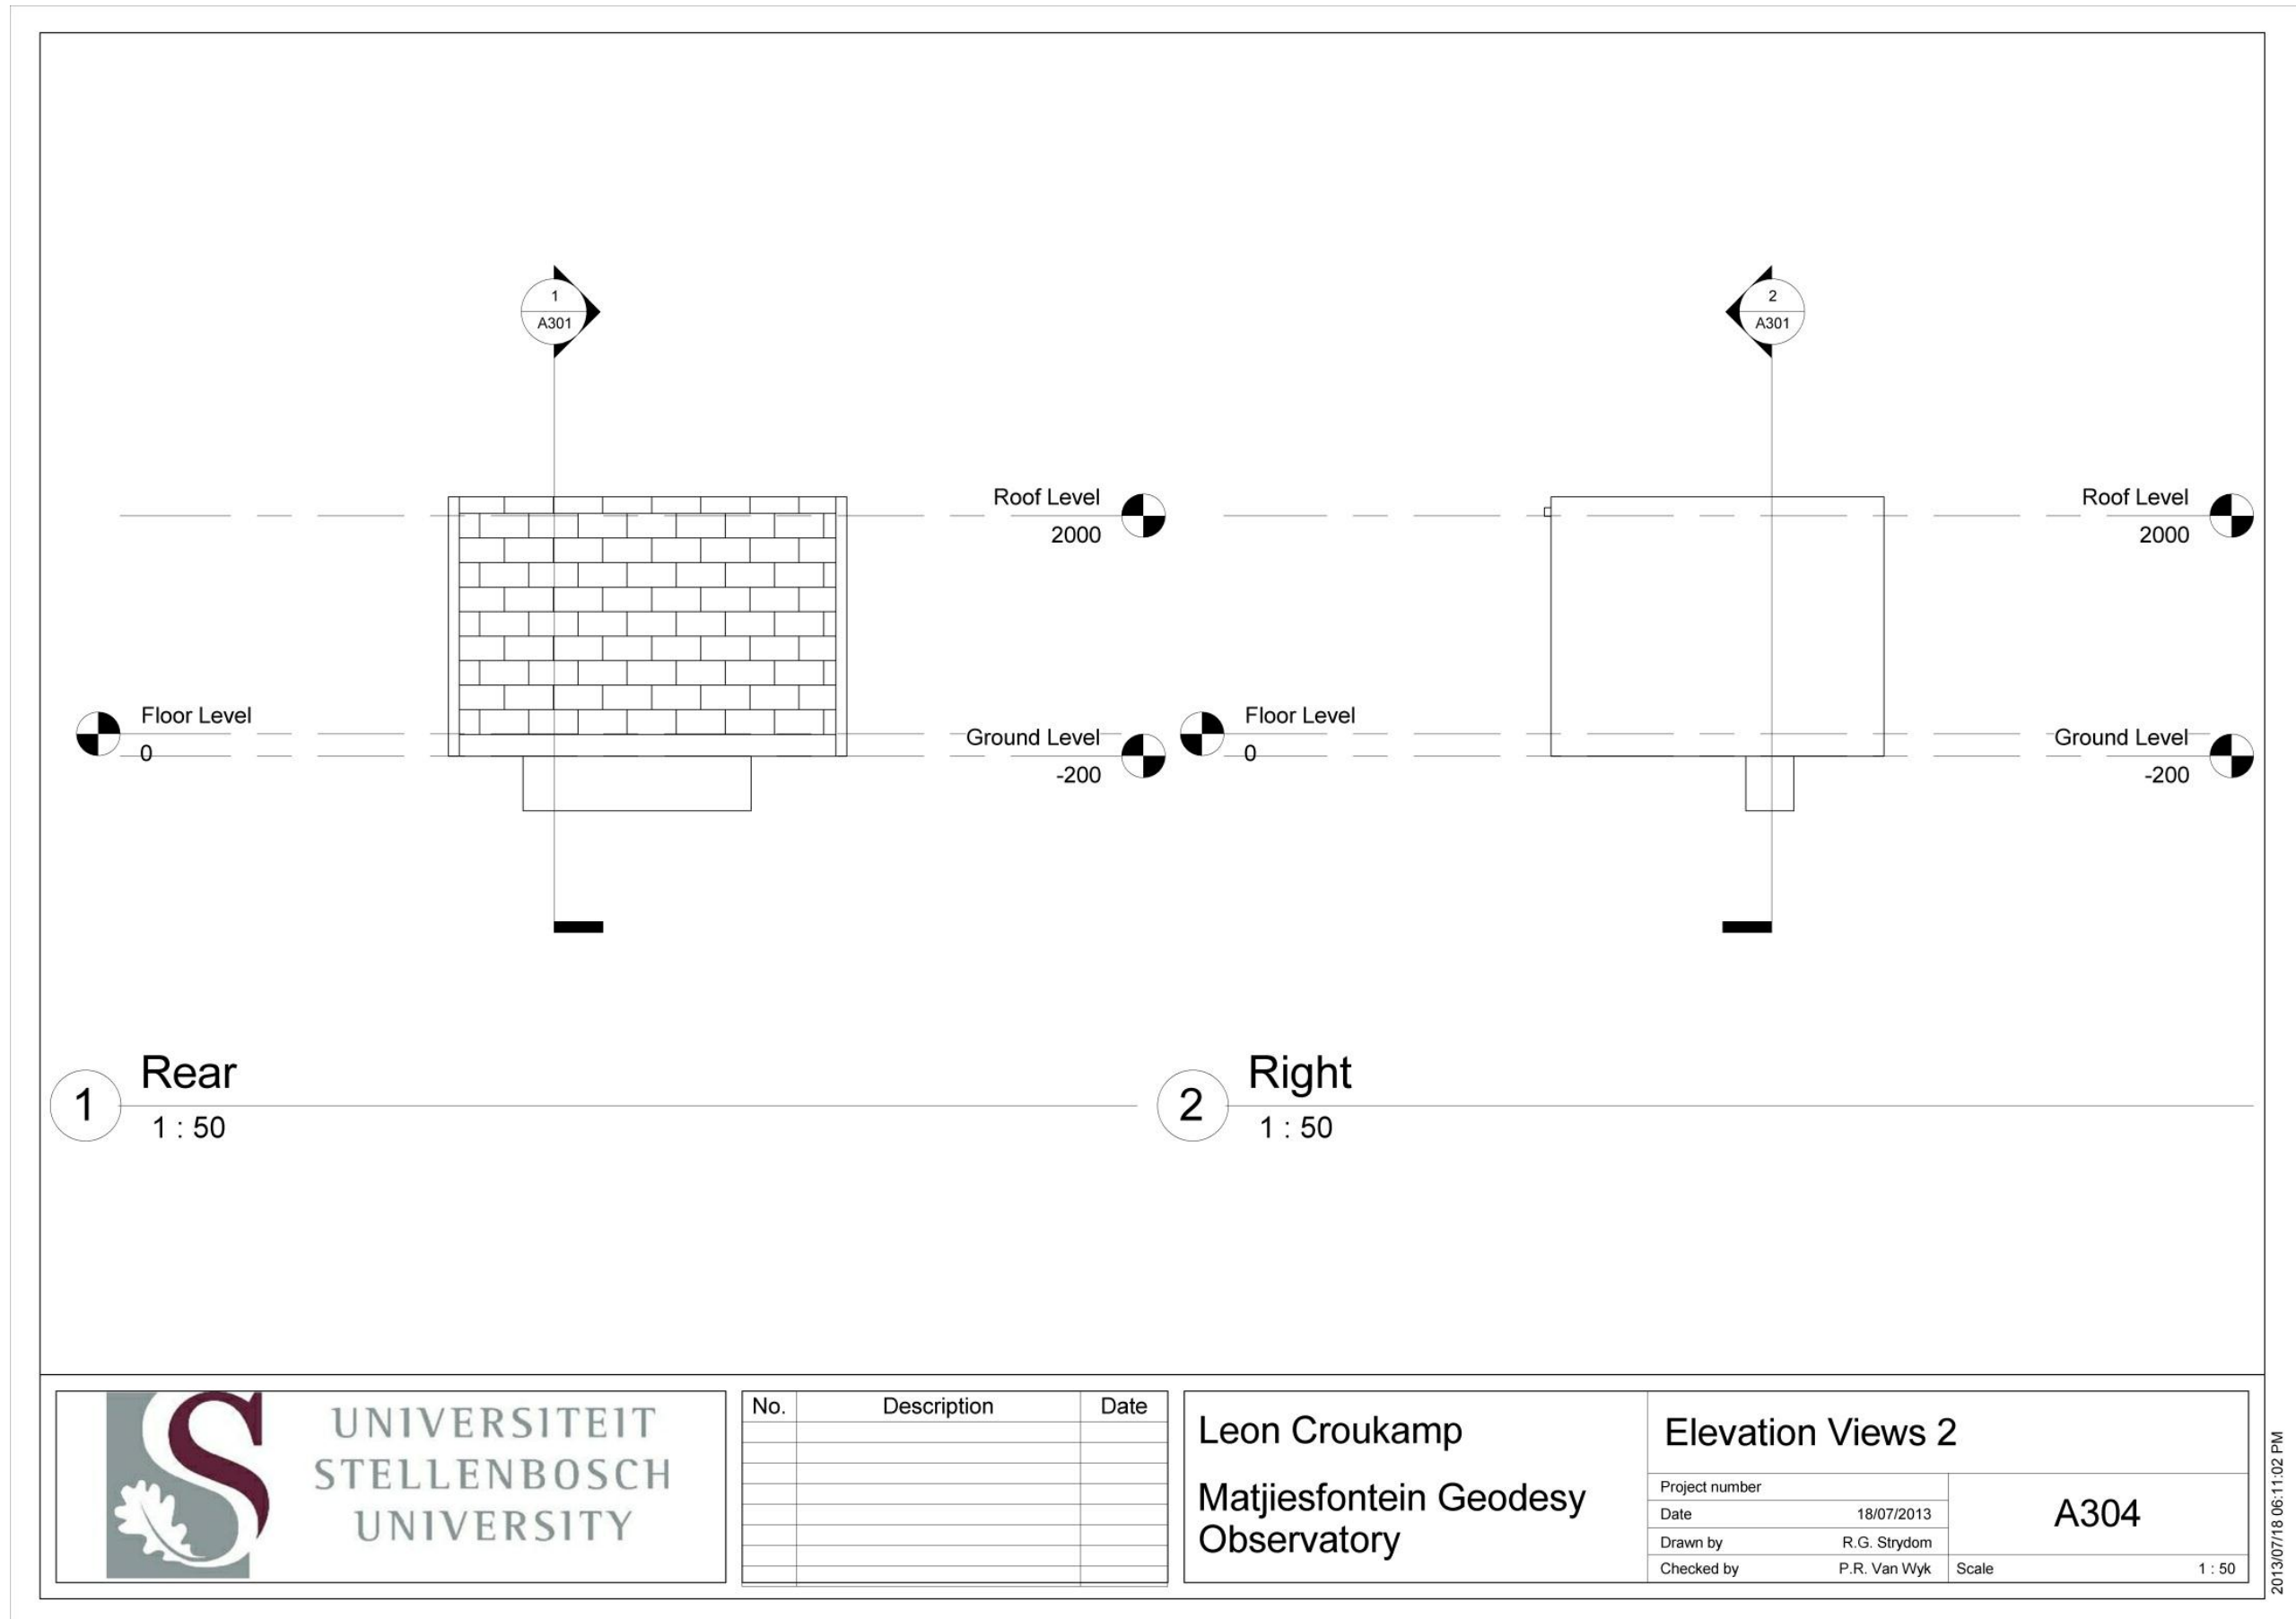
Gravimeter vault design. Rear and right hand side view.
